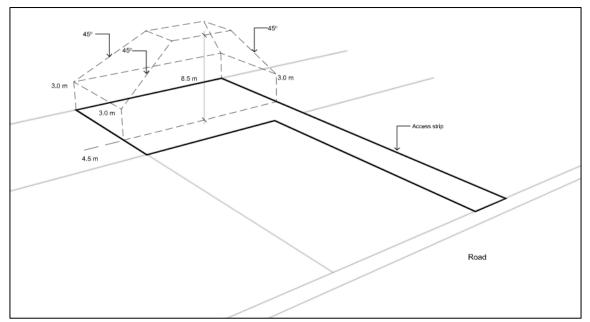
Building envelope for internal lots as required by clause 8.4.2 A3(a)
